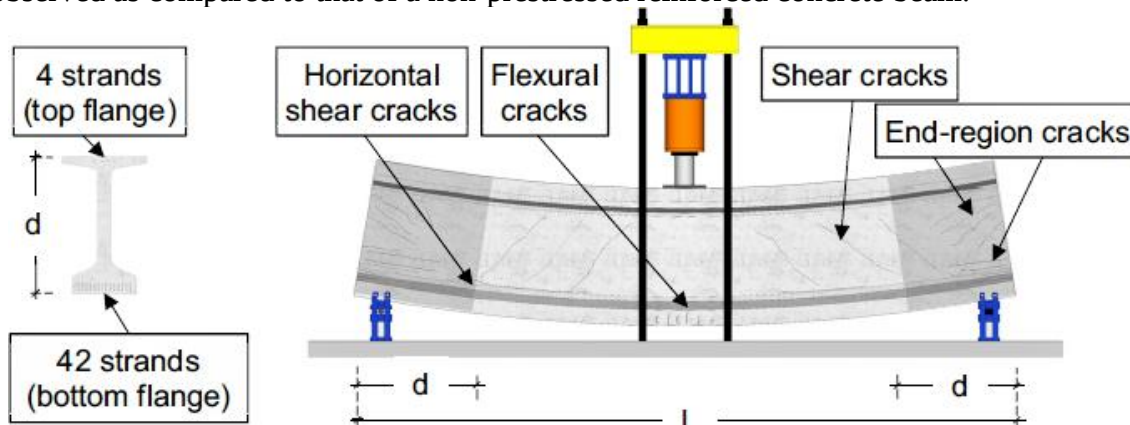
Section and cracking pattern of prestressed concrete girder { [23]}
